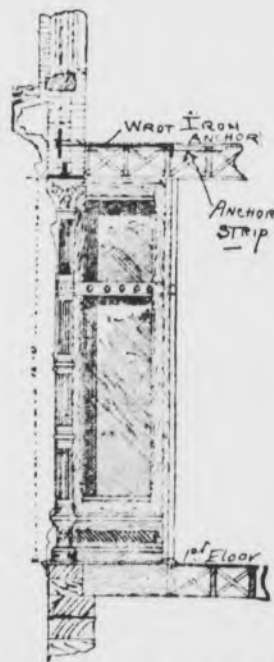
SECTION OF FRONT OF STORE, SHOWING ANCHORS, STRIPS, BEAMS, ETC.
